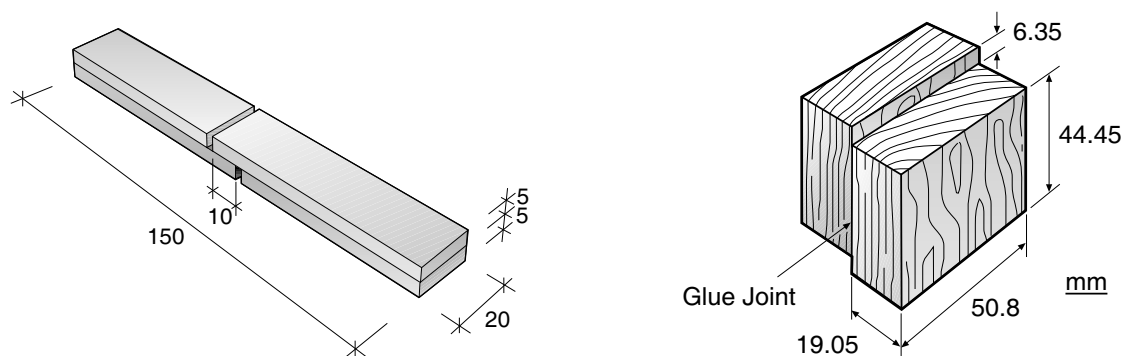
Geometry of the test specimens. Left: EN302-1. Right: ASTM-D905.
